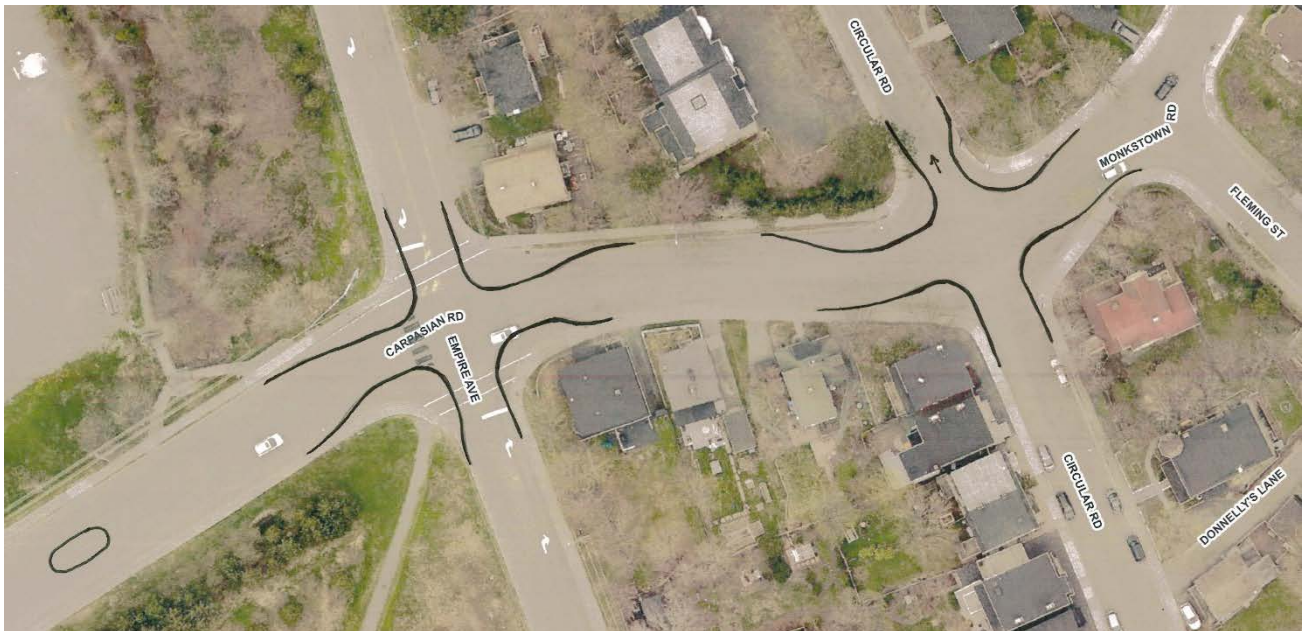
Carpasian Road Curb Extension and Traffic Calming Concept Plan
